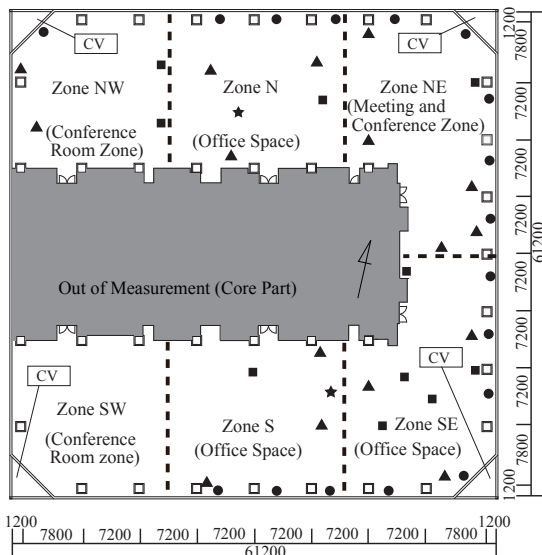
Plan View of One-floor Office Room and Measurement Points
